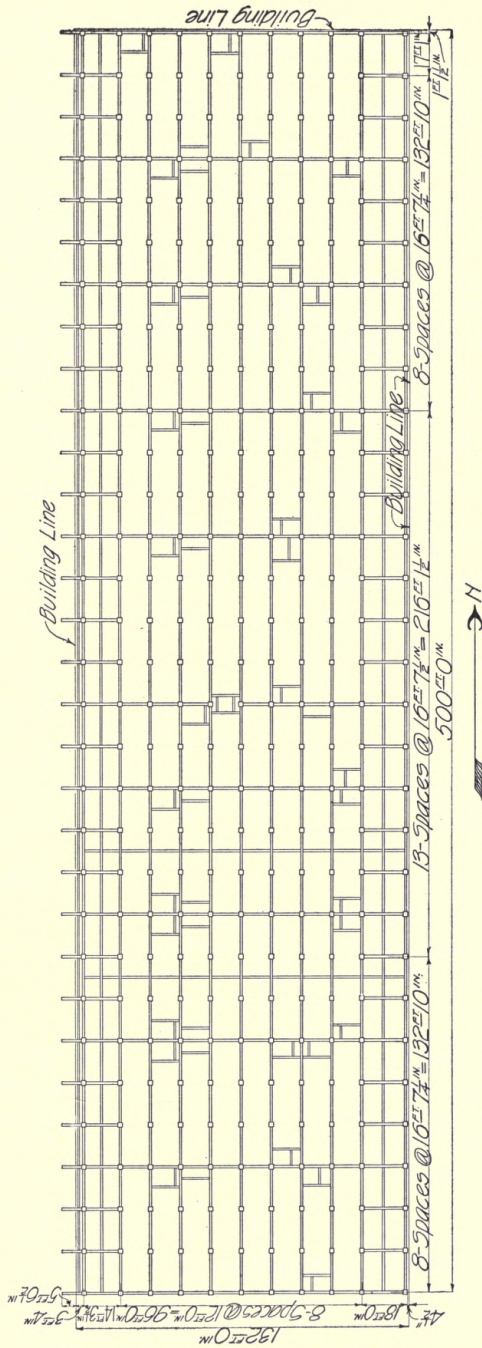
Typical Floor Plan of Wholesale Merchants' Warehouse. (See p. 103.)
